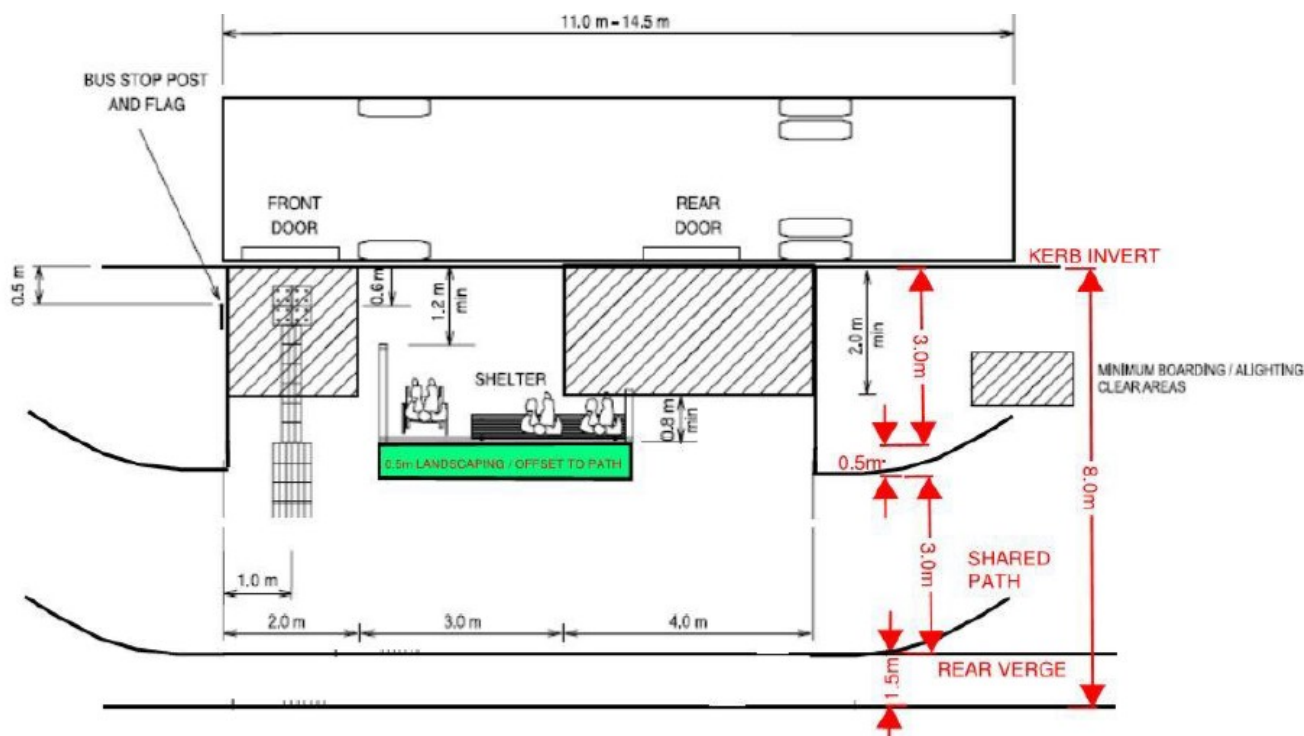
Typical bus shelter space proofing - shared path along westbound carriageway
